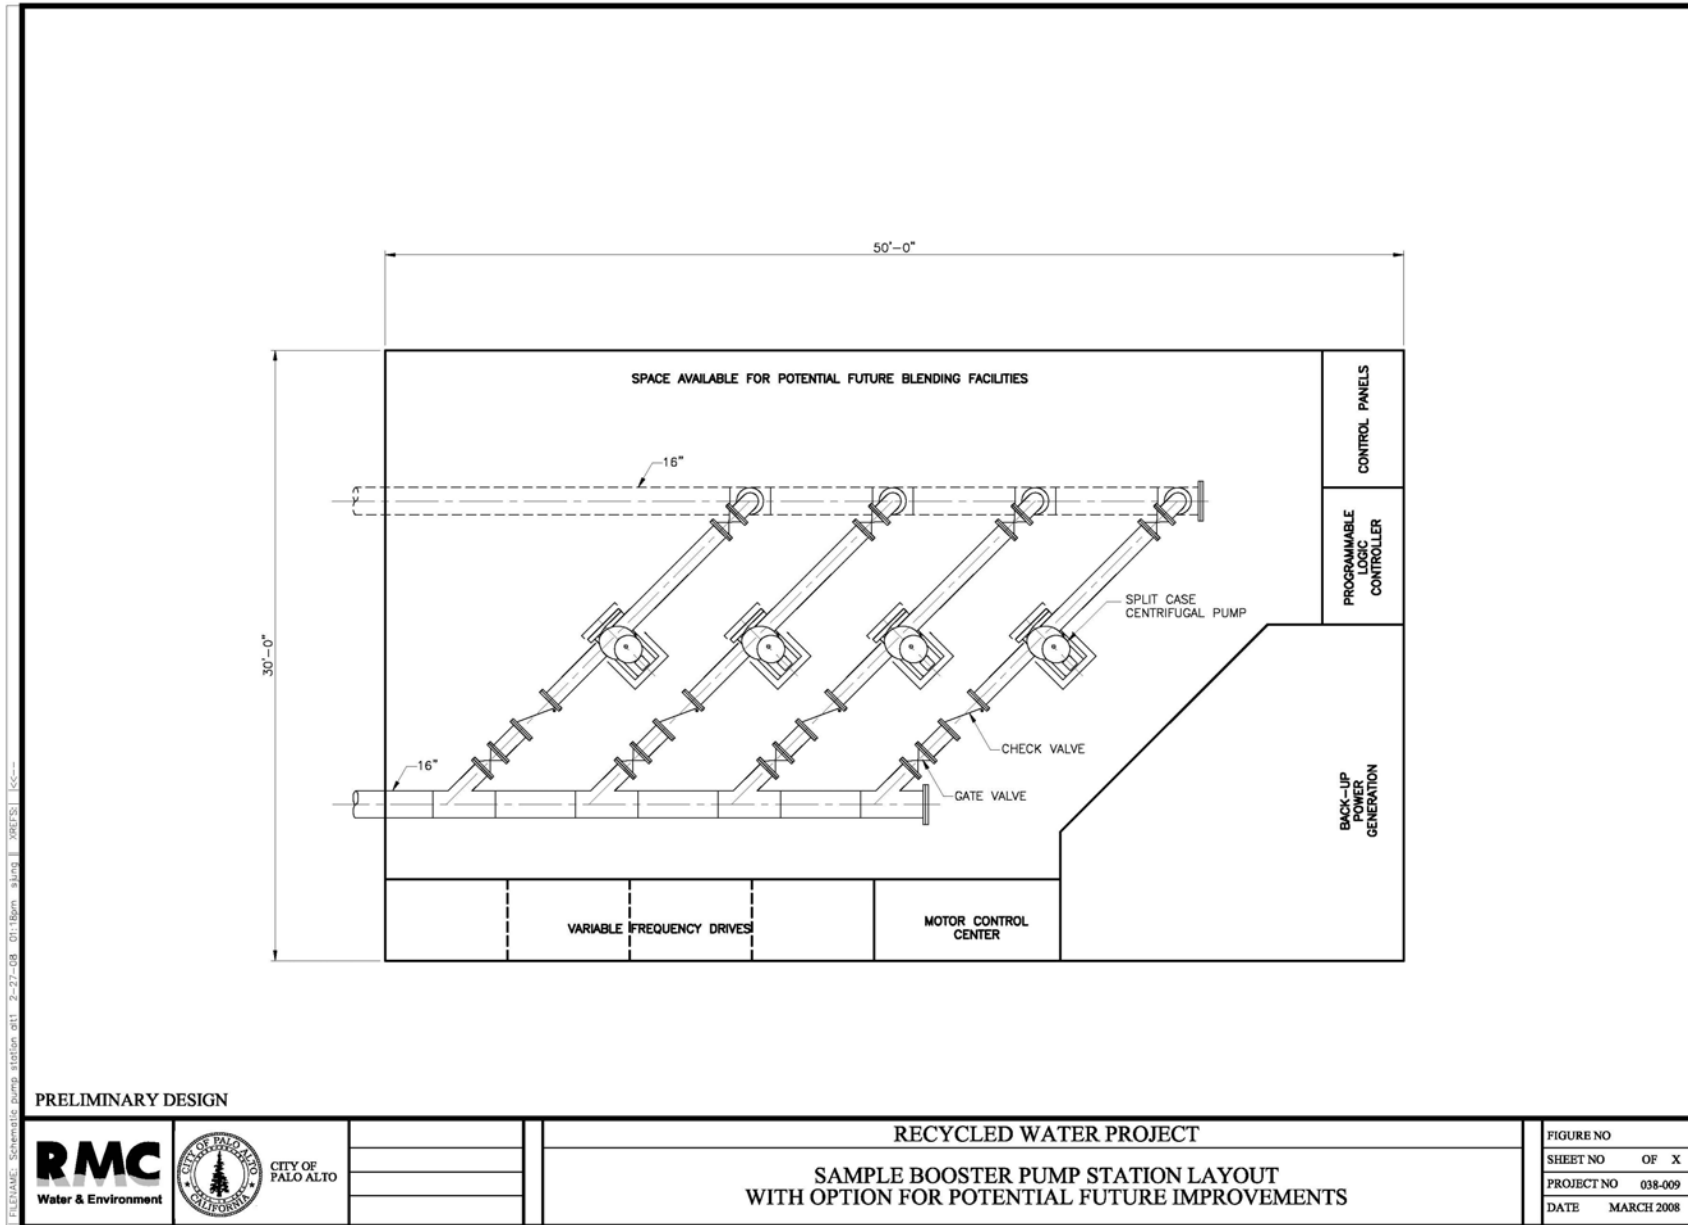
Sample Pump Station Layout with Potential for Future Improvements
